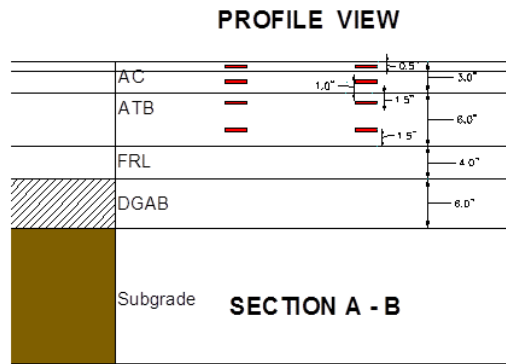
Illustration. Profile view detail of rosettes instrumentation for Sections A and B.
